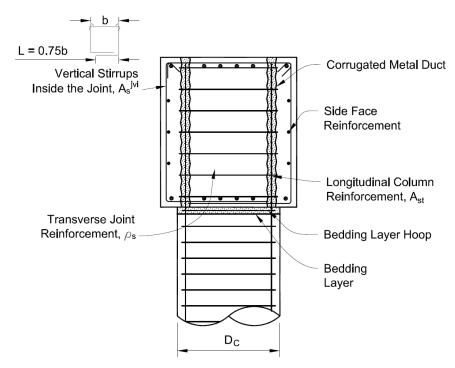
Grouted Duct Joint Shear Reinforcement Details (Section)—SDC A
